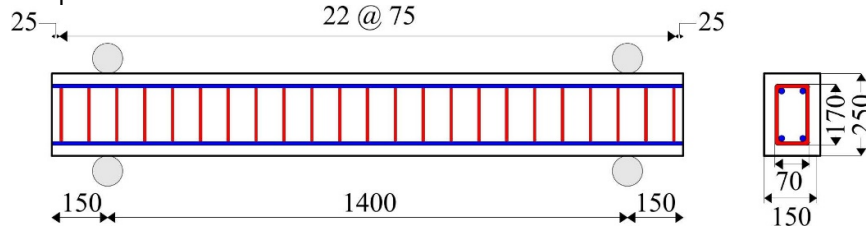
Dimensions and reinforcement details for beam specimens in Fujikake et al. [4]
